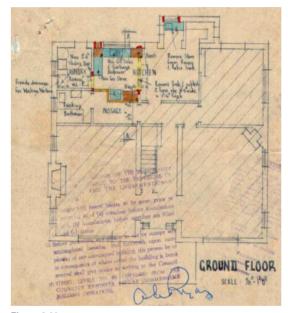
Proposed alterations to the building in 1958 designed by R. S Hamilton. Source: Woollahra Council
